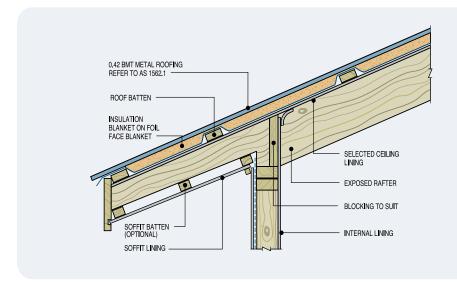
Cathedral Roof/Ceiling Construction. Section through roof
